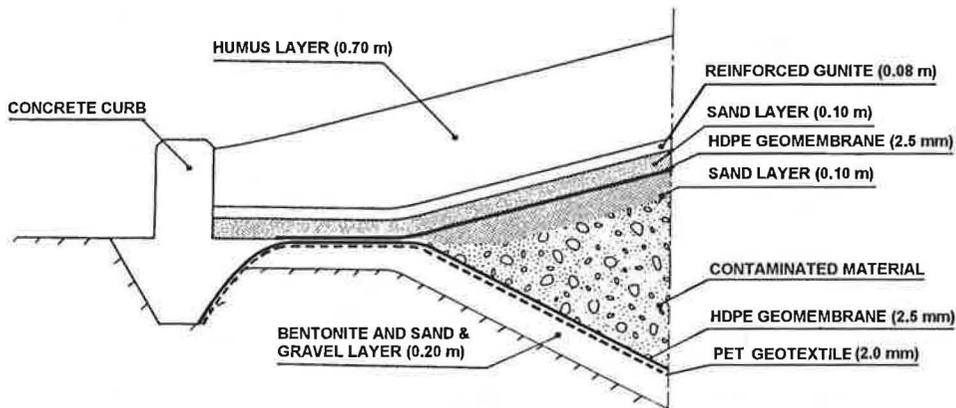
Detail of the HDPE geomembrane anchorage to the slope edge
